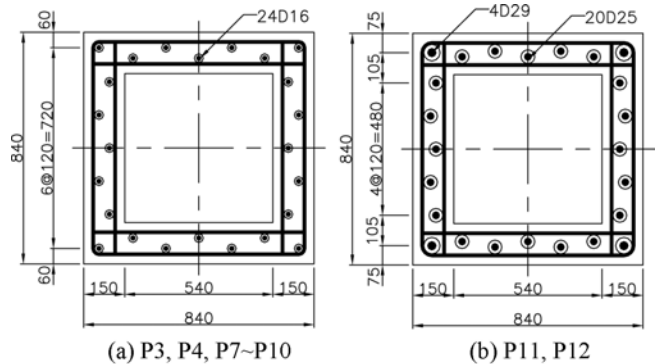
Cross section of column (cross ties are not shown) (unit: mm)
